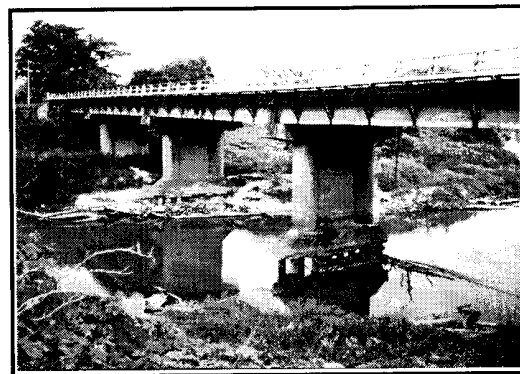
General scouring at pier exposing the piles and threatening stability of the bridge
